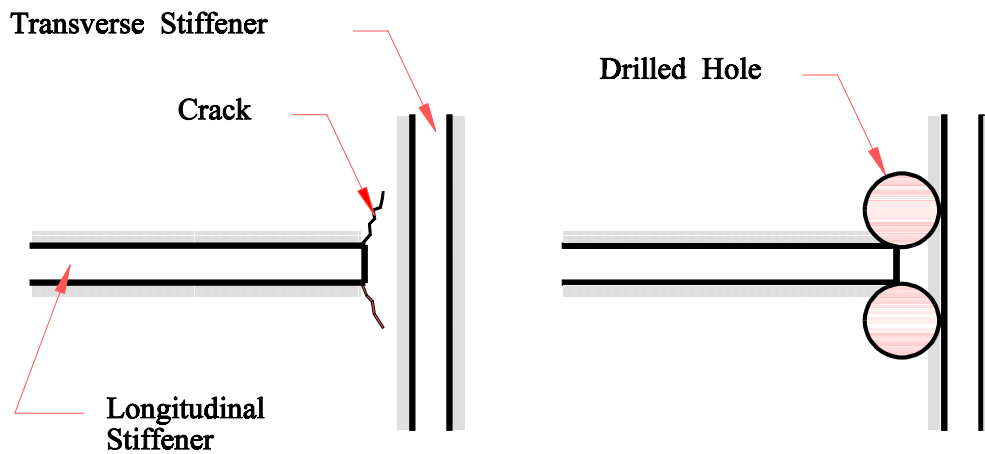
Crack and drilled hole locations for longitudinal stiffener termination at transverse stiffener.
